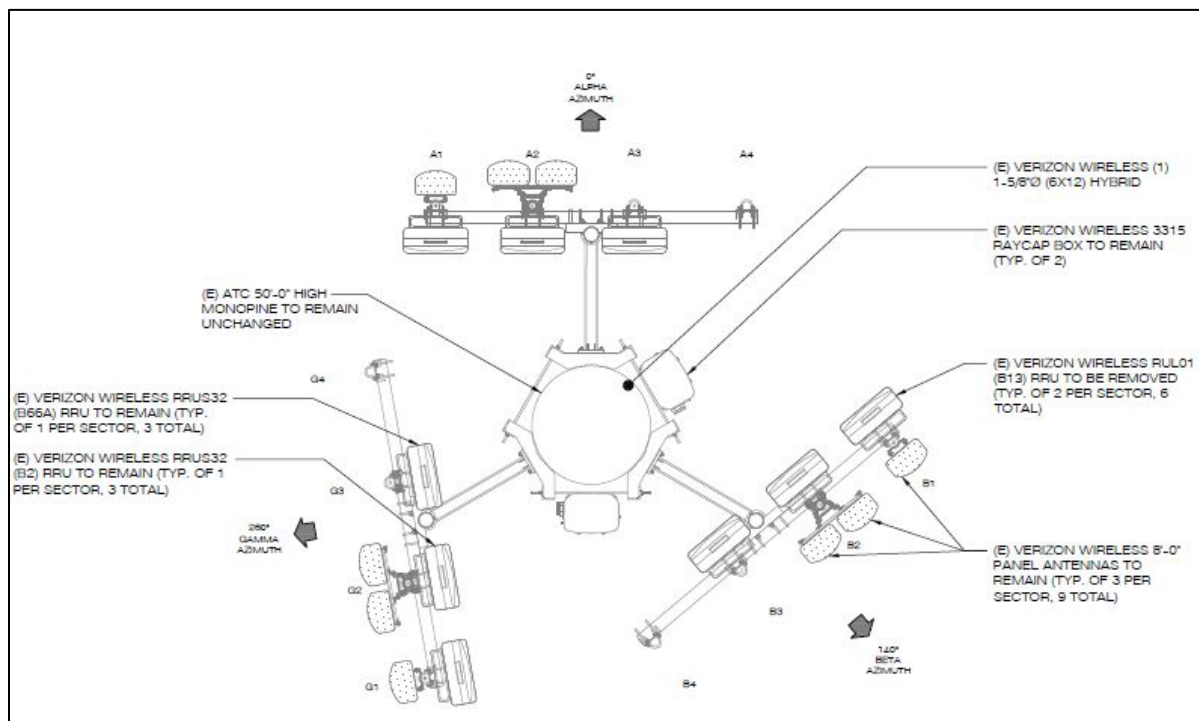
Existing antenna layout on the Monopine (Source: Plans, page A-3).
